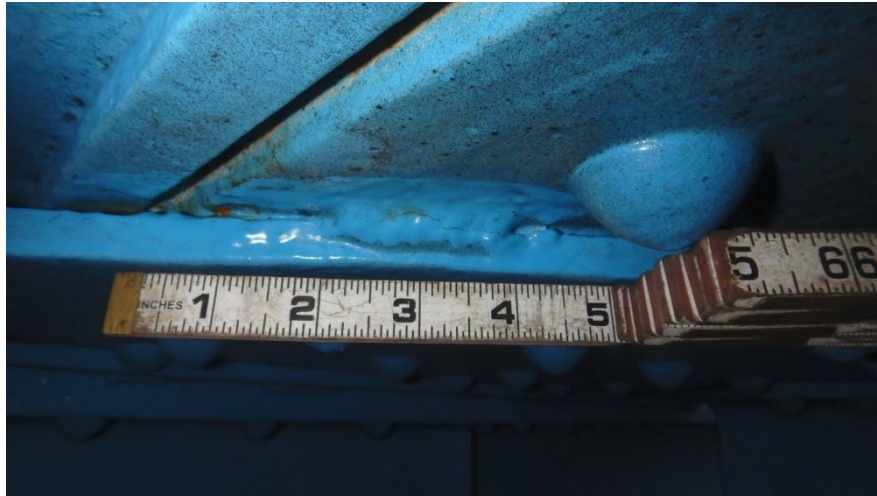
Tack Weld on a Riveted Built-up Truss Member
